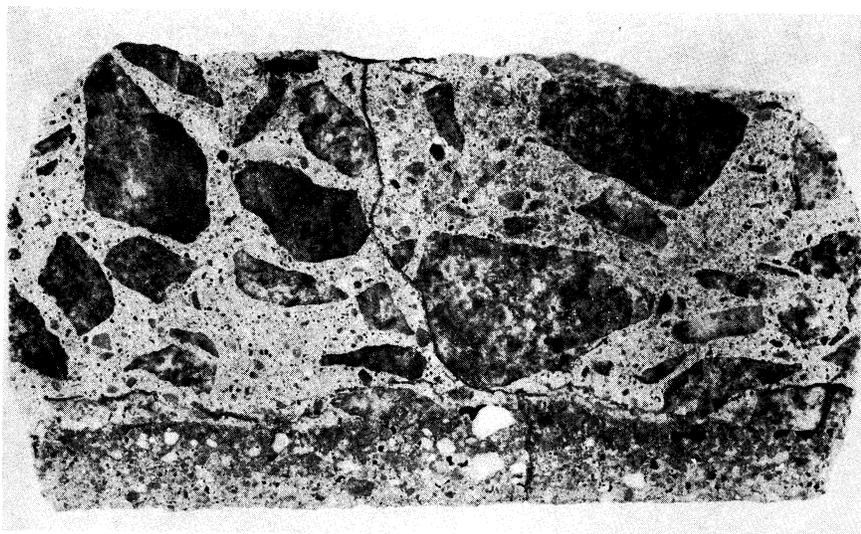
Section of core showing transverse cracking in the latex mortar overlay and the original concrete. A horizontal crack just below the bond line can be detected in the photograph.
